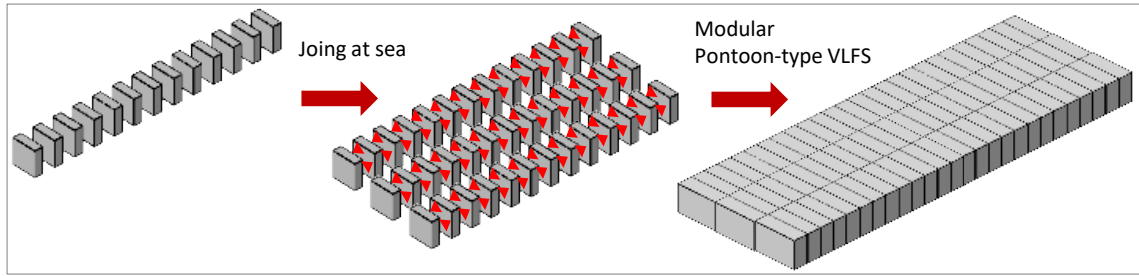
Multi-module construction method, assembling stage and VLFS assembled.
